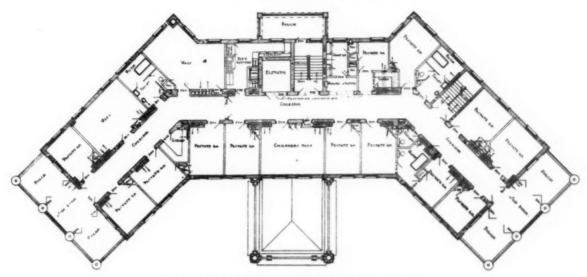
Edward W. Sparrow Hospital. Second floor plan.
